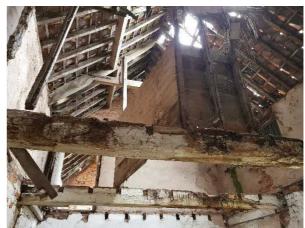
Looking north within the southern main space showing doorways through to northern space at ground and first floor levels.
